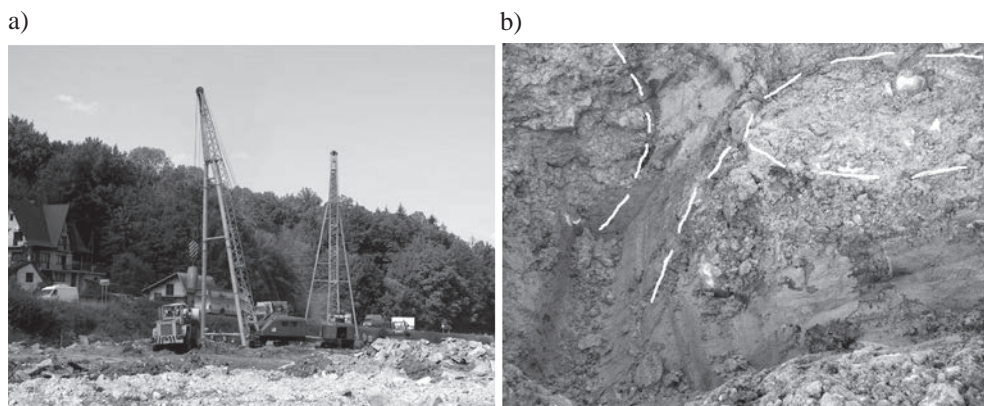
a) equipment used for soil reinforcement, b) excavated column
